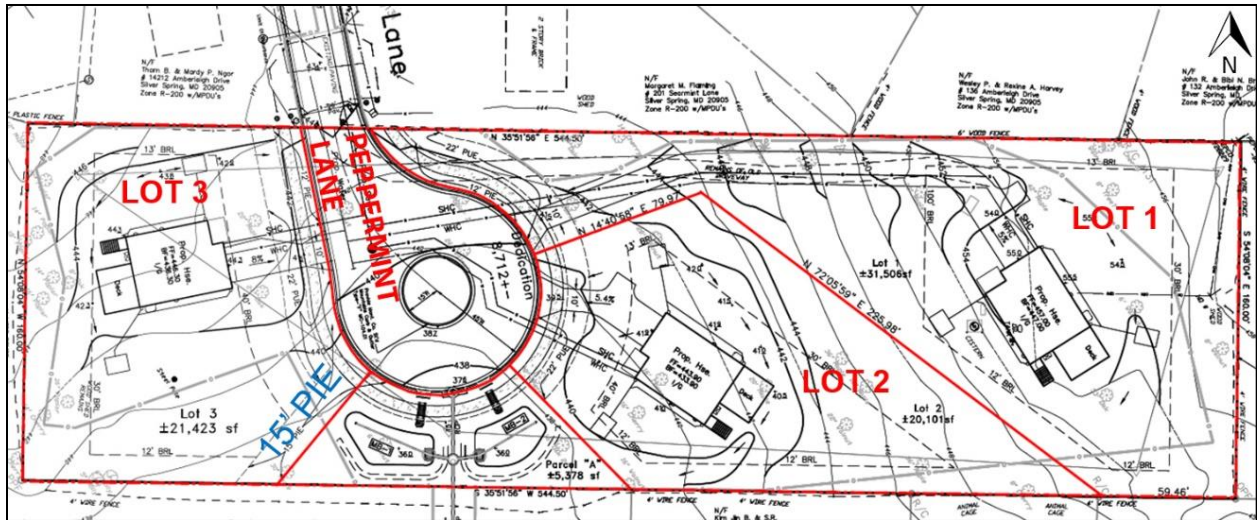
Approved Preliminary Plan Layout with Three Lots Outlined
